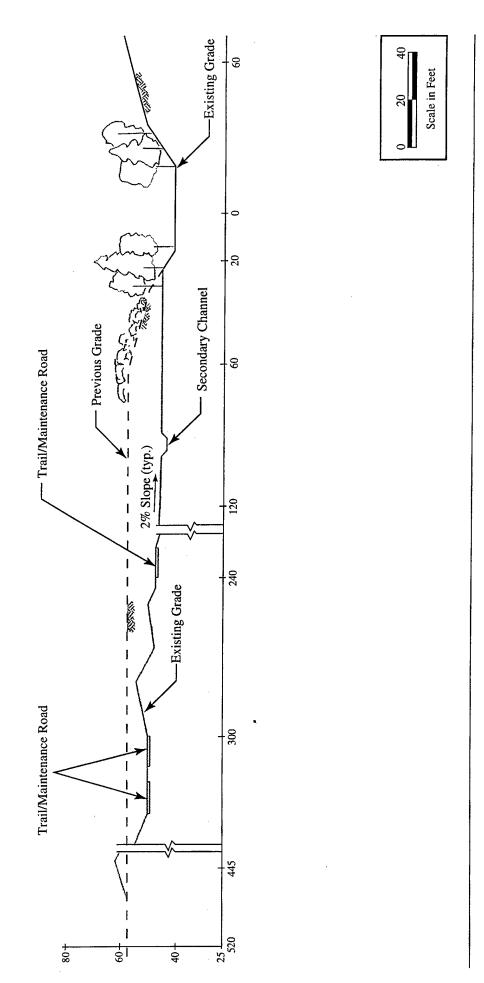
Guadalupe River Project Segments 1 and 2 Cross Section
